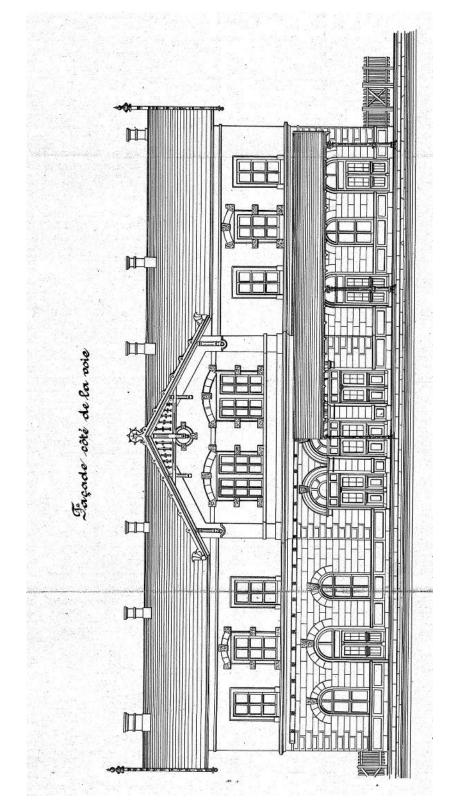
Ist class station building project drawn for Konya / Front Elevation
